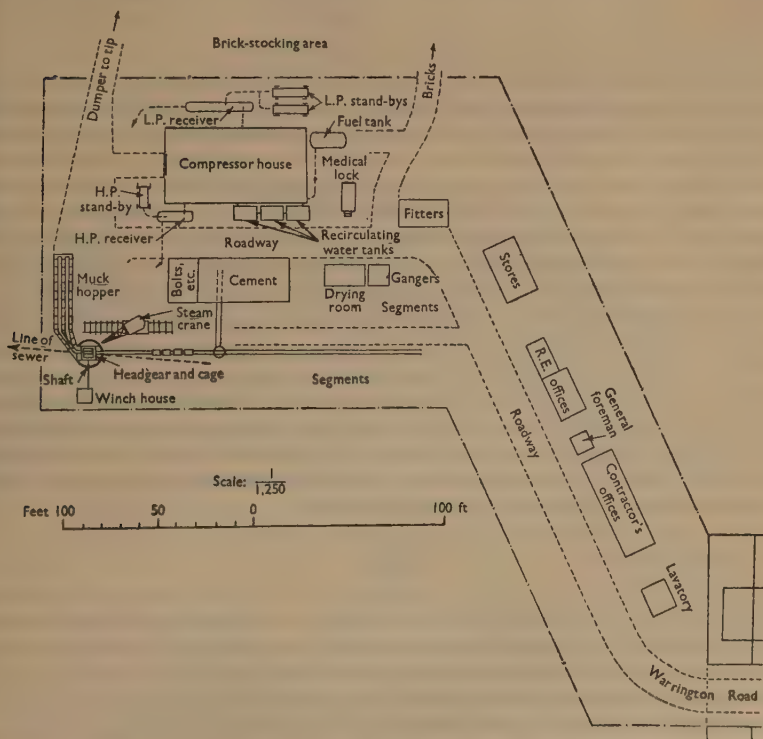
LAYOUT AT MAIN WORKING AREA ON SECOND SECTION
